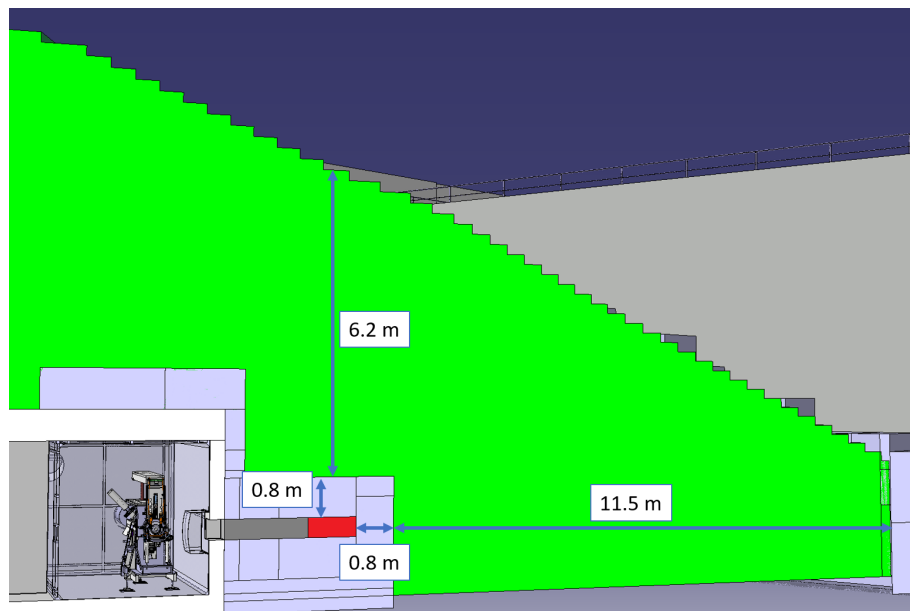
Section showing the HRS dump in red, the concrete blocks in grey, and the soil in green..
